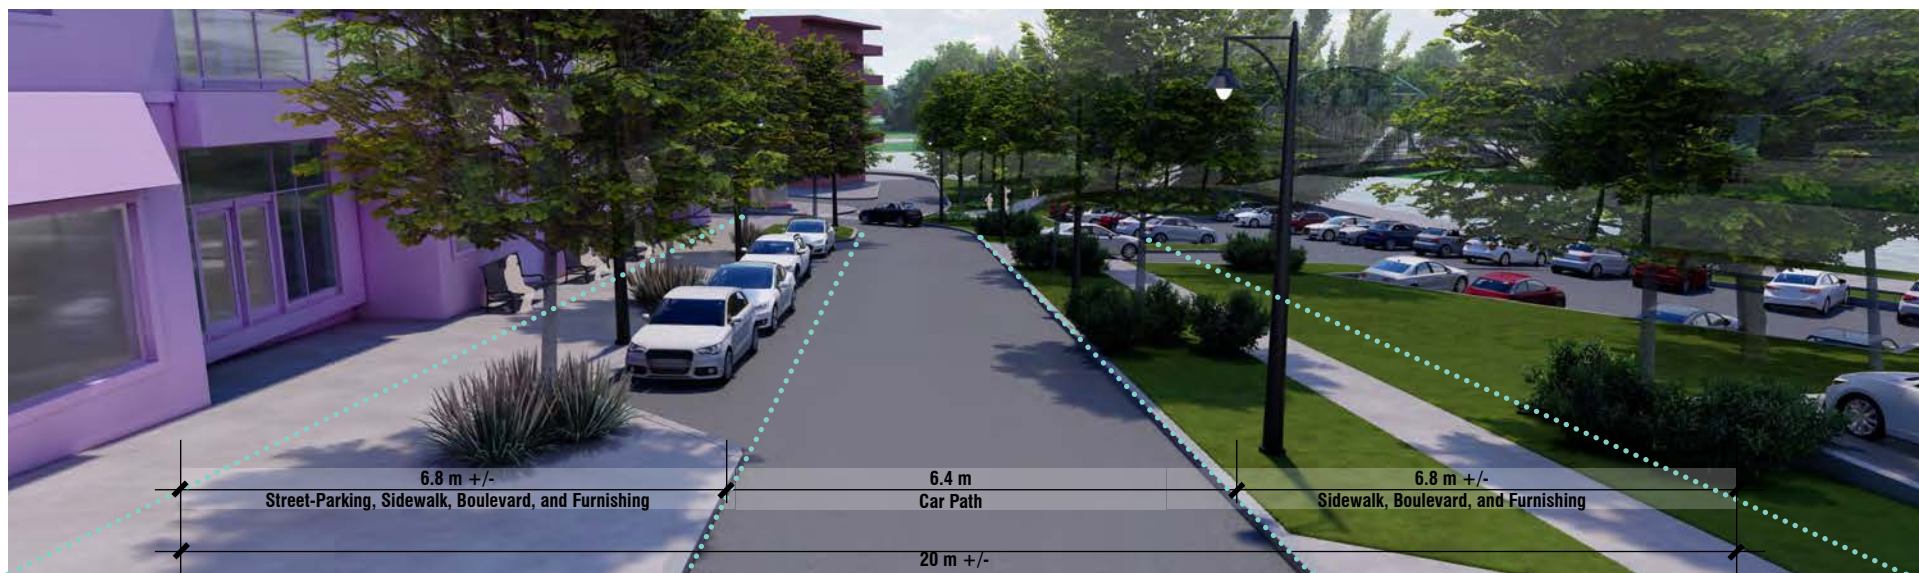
20m ROW Cross Section With Street Parking - Market St.
